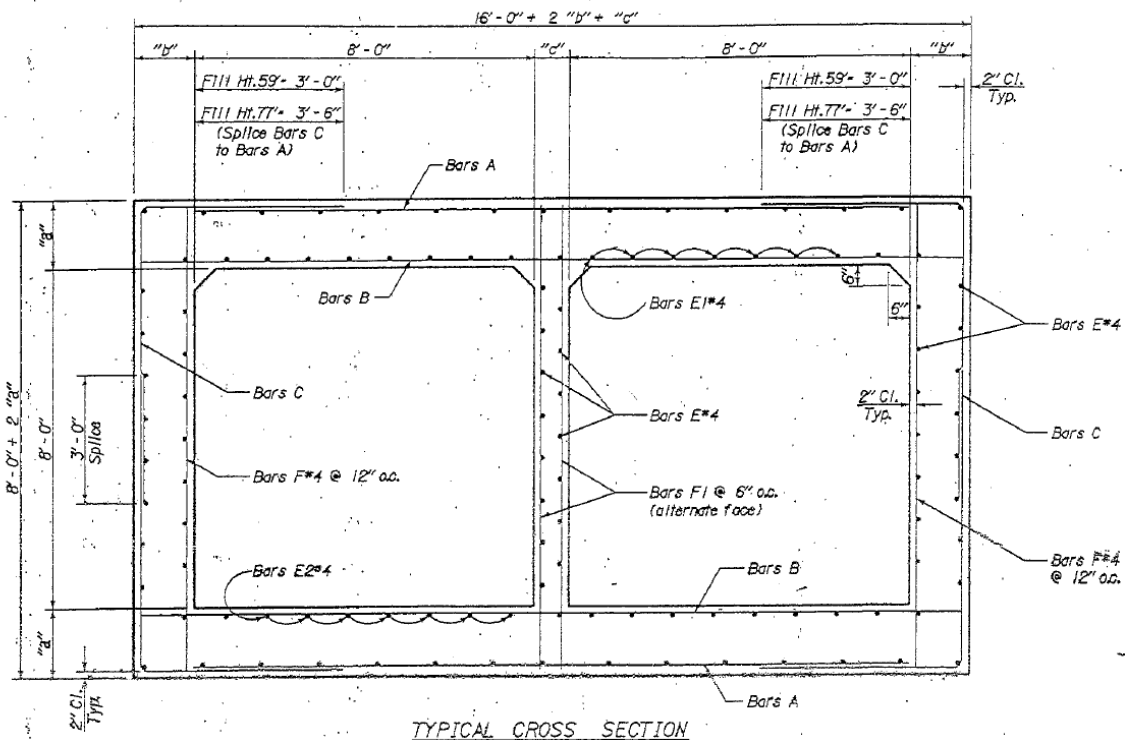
AEB Culvert at 240+37 Cross-Section (ALDOT n.d.a)
